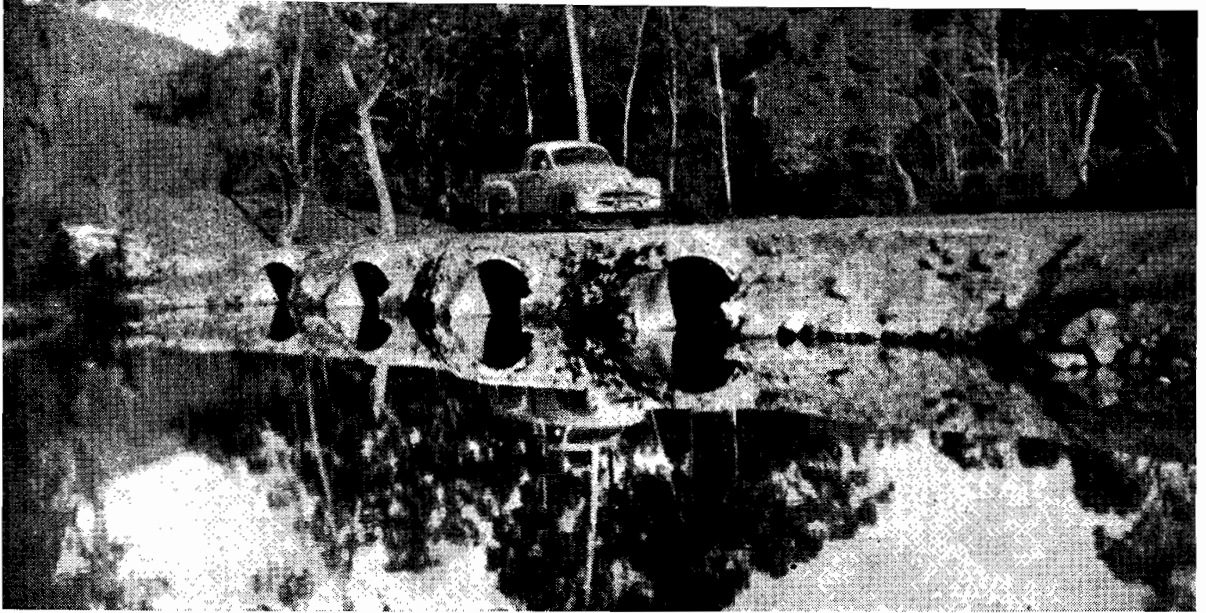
Armco pipe culvert on Suggan Buggan Road over Toonginbooka River.
